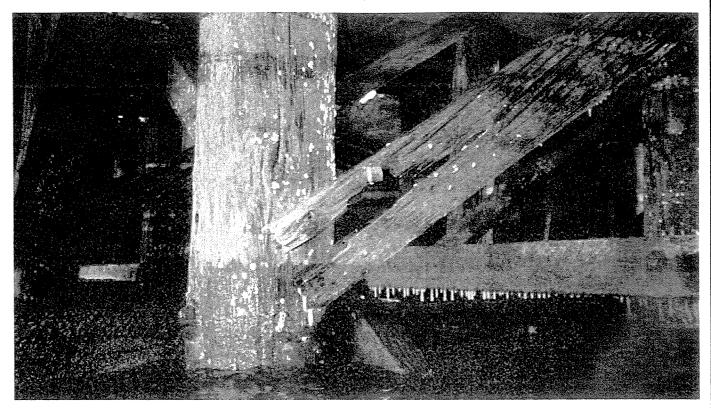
Pile 74 A, E/W diagonal brace is broken and loose looking SE.
